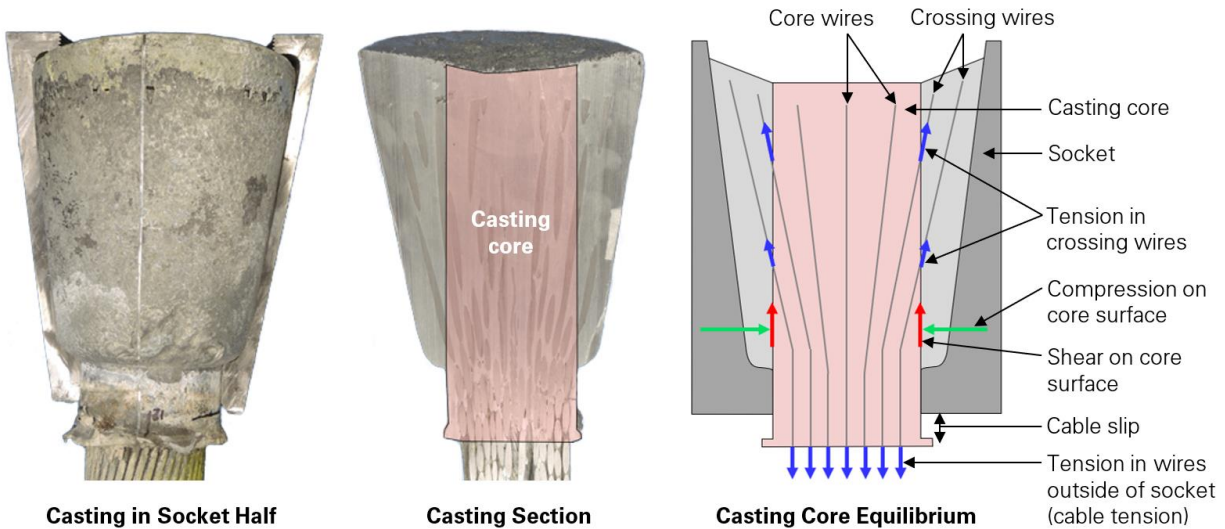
Equilibrium of socket casting core (photos: Socotec).
